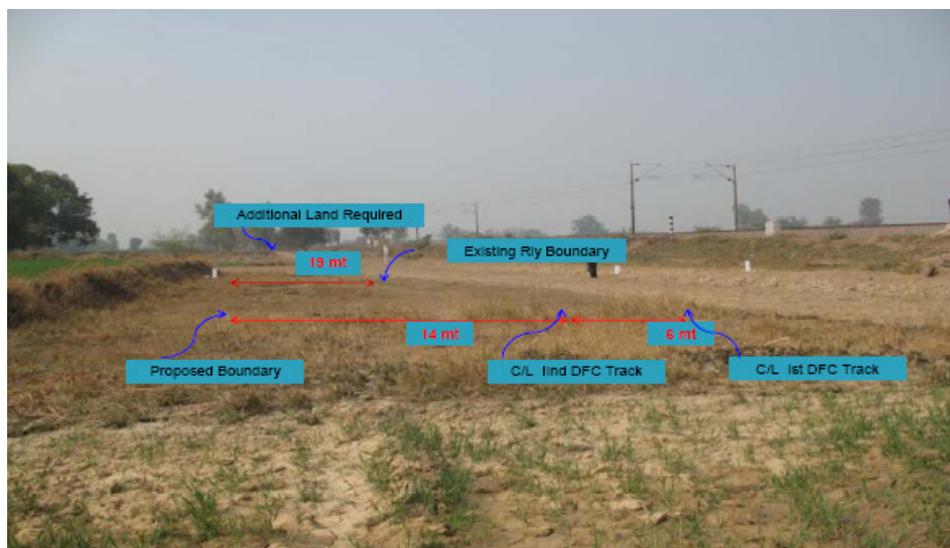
Typical layout of land having DFC and existing Railway track
